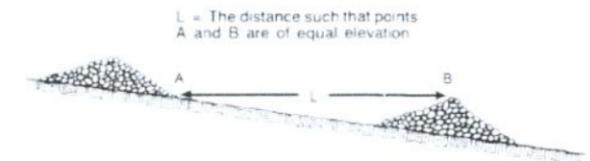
Space check dams in a channel so that the crest of downstream dam is at elevation of the toe of upstream dam
